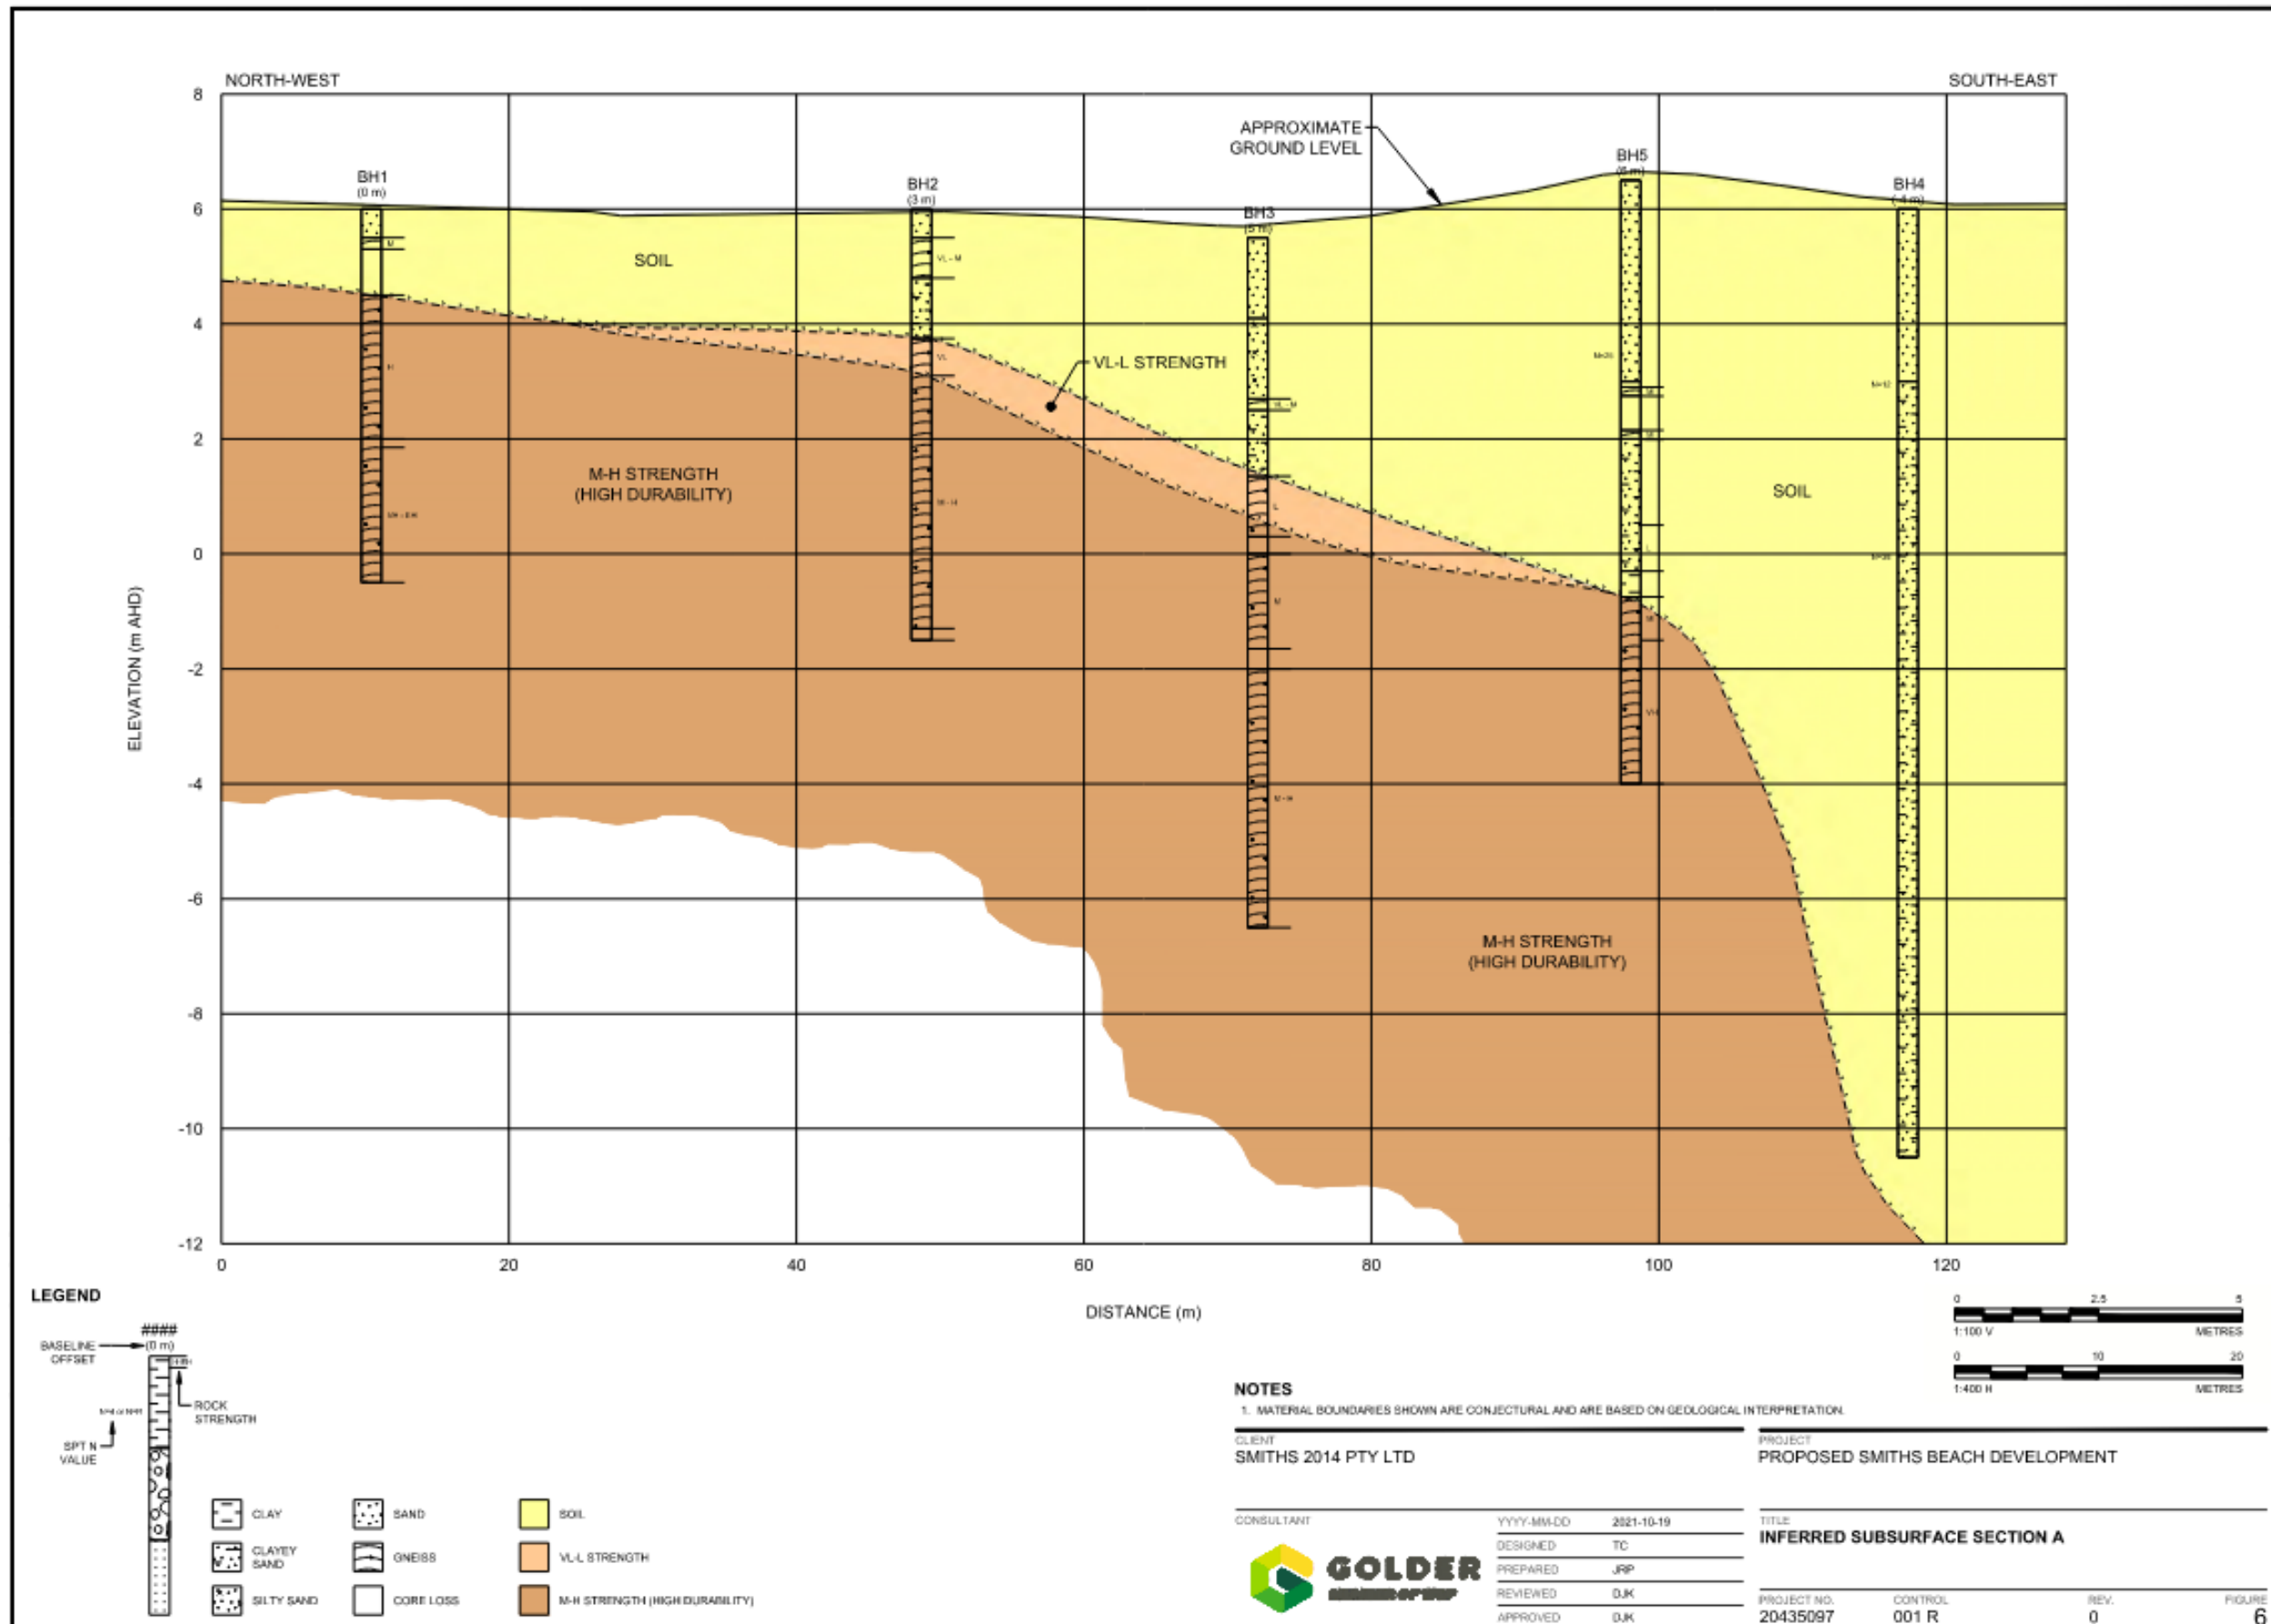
Inferred Rock Surface Elevation – Section A (Golders, 2021)
